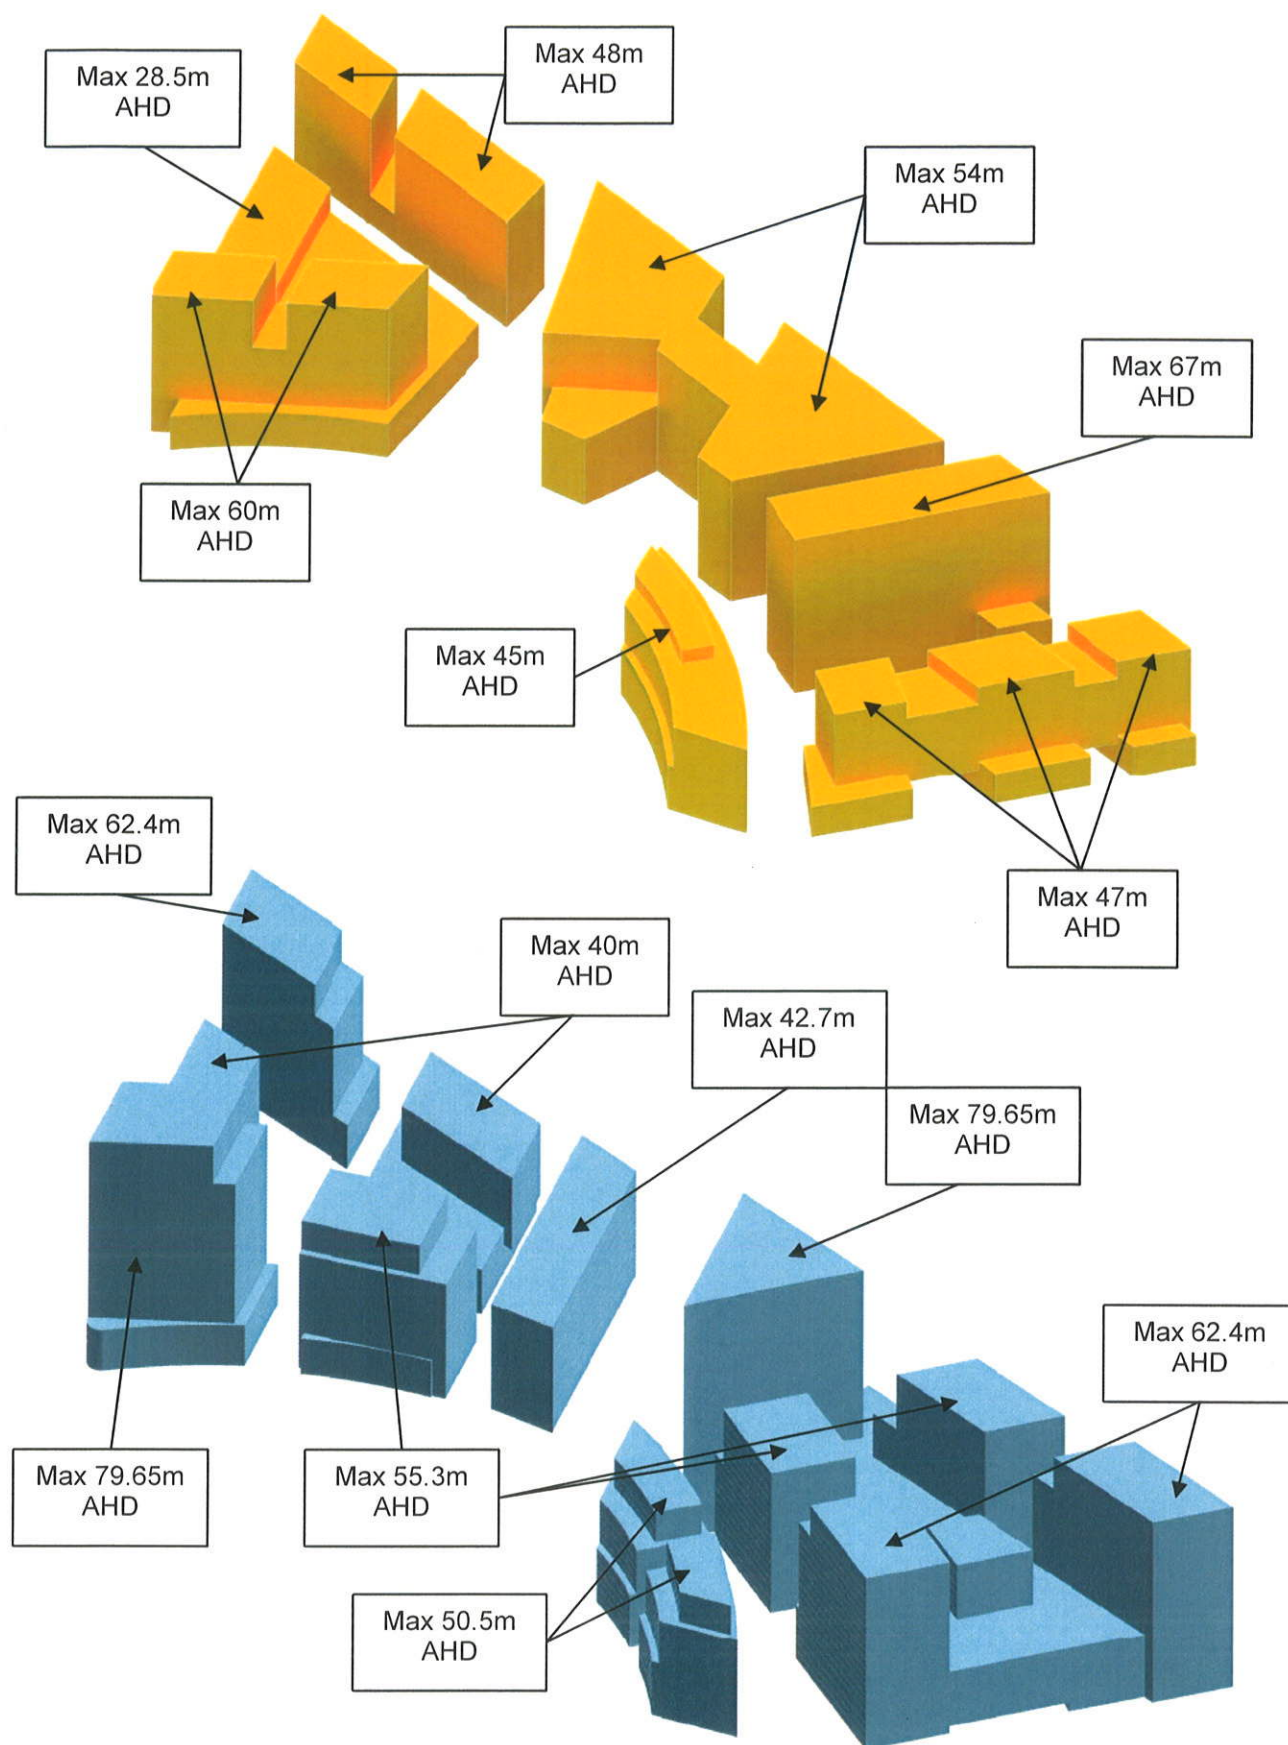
Comparison of Masterplan (orange) and Concept Plan (blue) building envelopes (not including sites built or under construction), as contained in the PPR. Heights provided by Department of Planning based on EA / PPR documentation.
